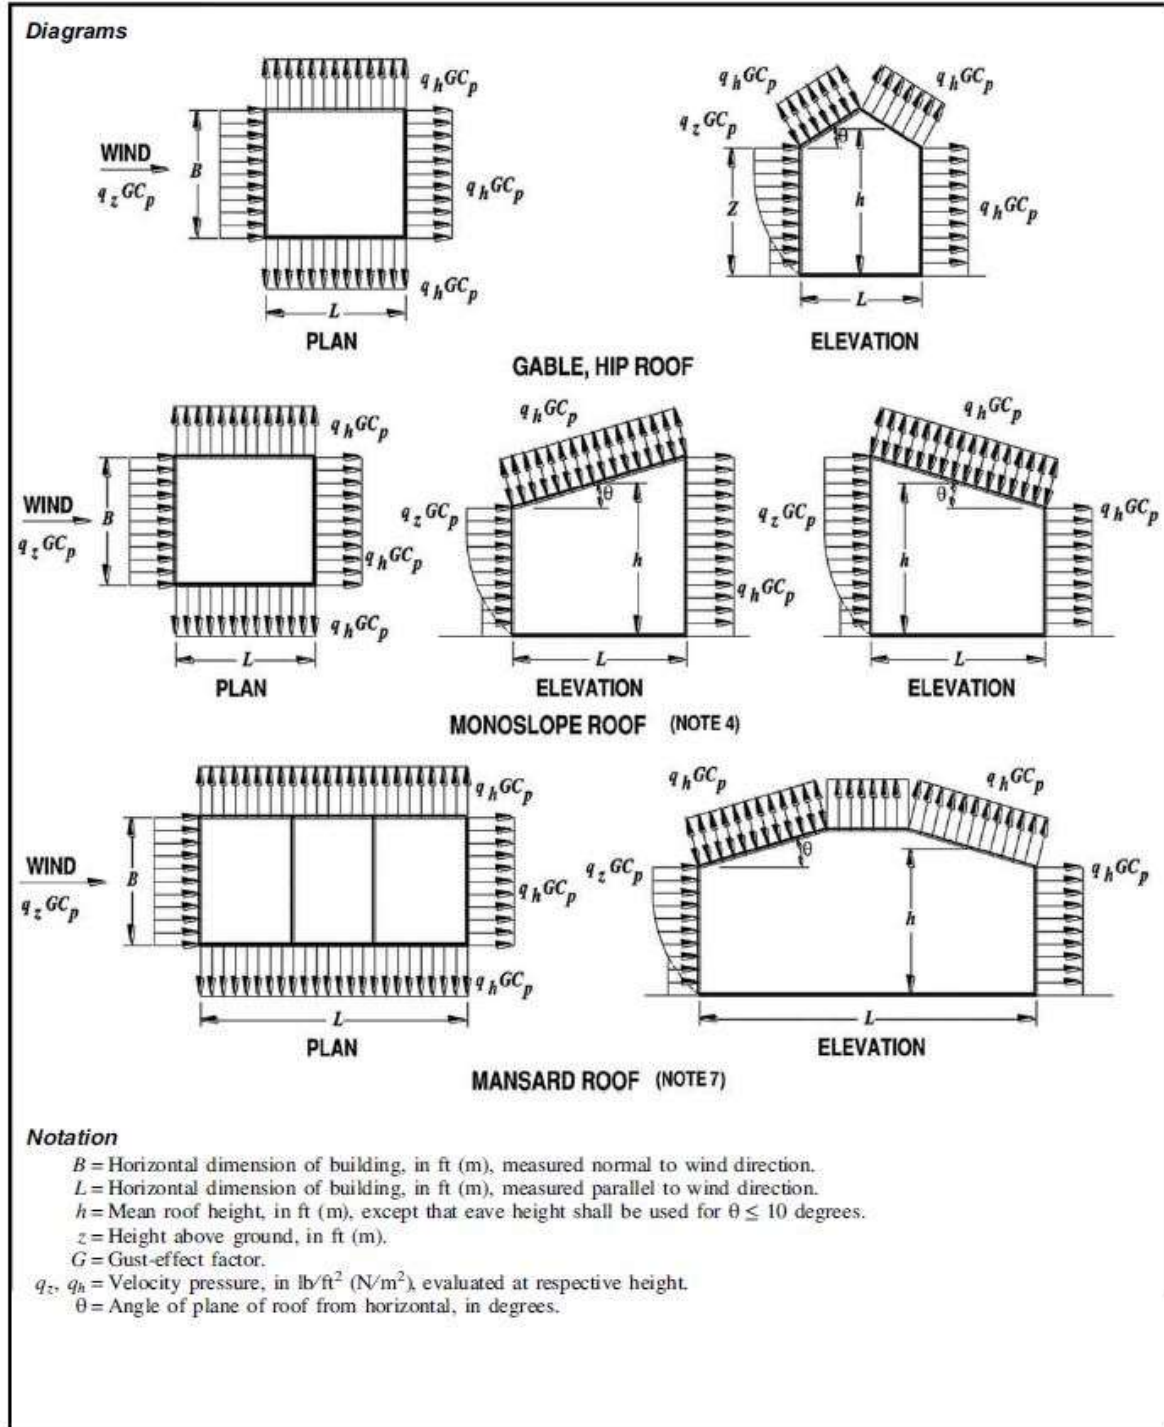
Main Wind Force Resisting System, Part 1 (All Heights): External Pressure Coefficients, C_p , for Enclosed and Partially Enclosed Buildings—Walls and Roofs
